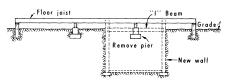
When excavating a small basement, take care not to let sliding soil undermine nearby foundation piers or walls.
